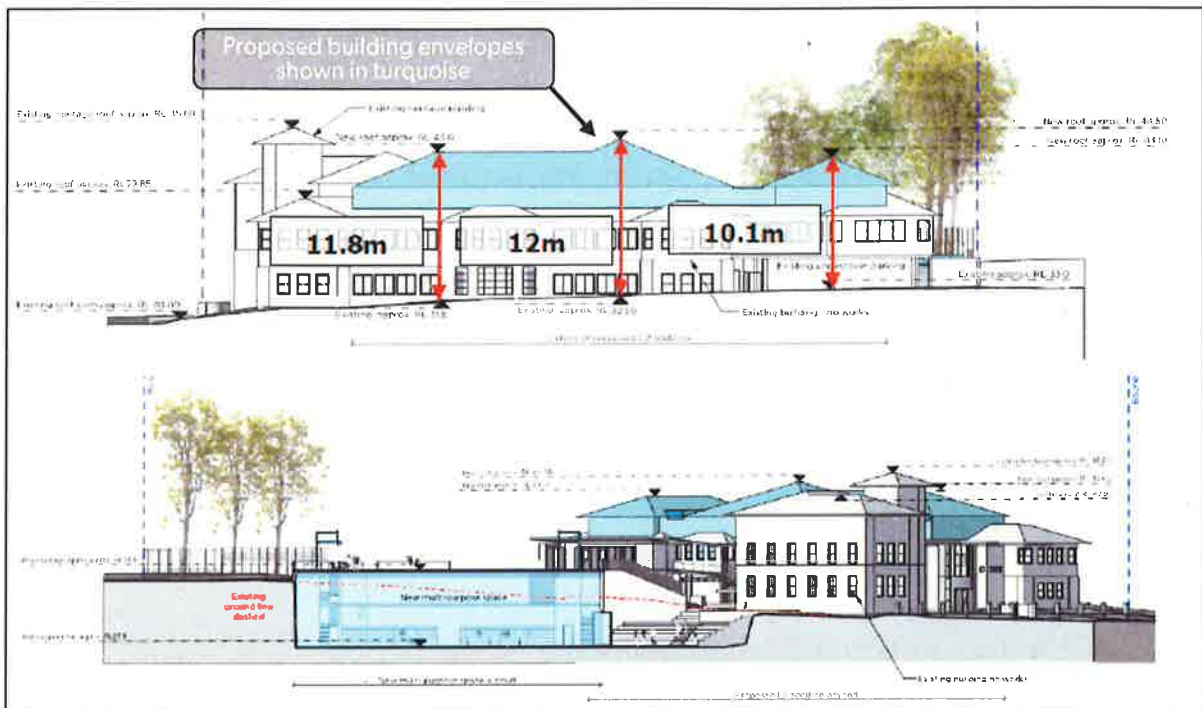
| Proposed building envelope heights at the Junior Campus (Source: Applicant's EIS 2018)
